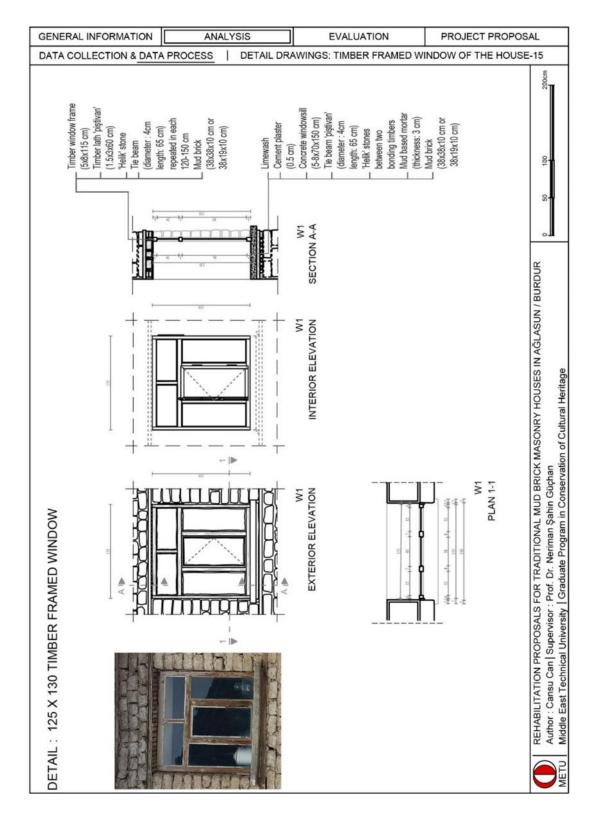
Detail Drawings of a Timber Frame Window (House-15)
